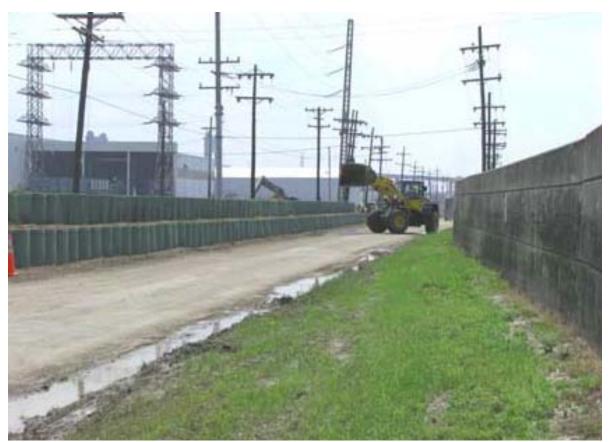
Temporary Bin Wall under construction, IHNC northwest along France Road (<u>http://www.mvn.usace.army.mil/HPS/Status%20Report%20Newsletters/Sept\_9\_2008.pdf</u>)
